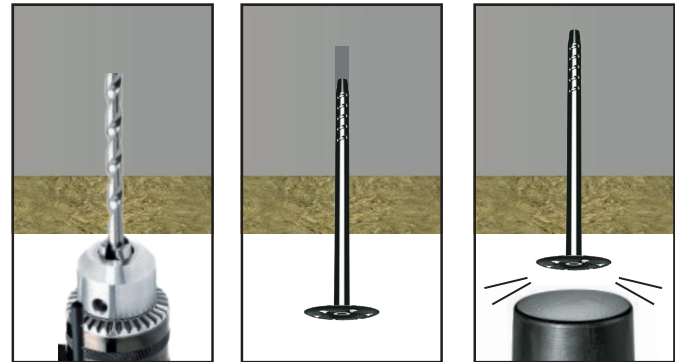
Pre drill slab and concrete and drive the anchor into the hole until the head of the anchor is in contact with the insulation
